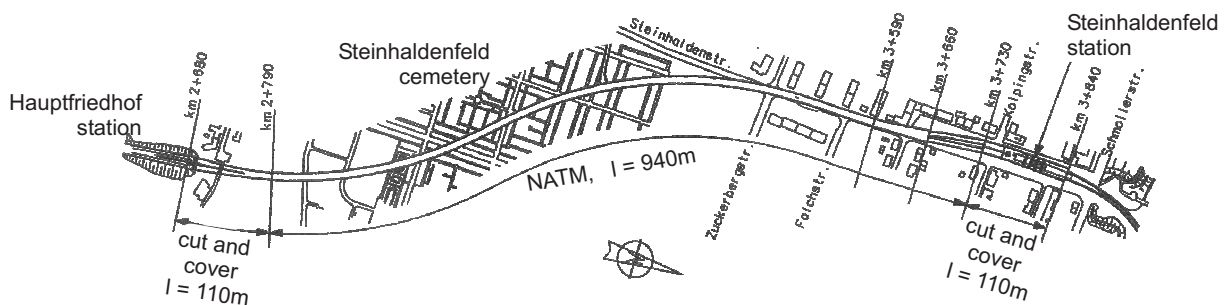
Site plan of Steinhaldenfeld tunnel (TIEFBAUAMT STUTTGART)
